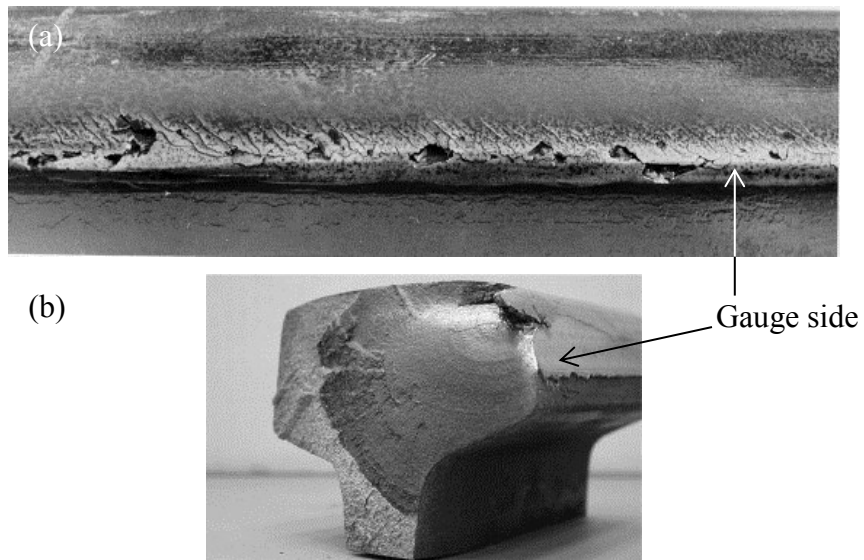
Rail defects resulting from head checks: (a) spalling originating at head checks, and (b) a rail fracture originating from a head check [3]. Copyright 2009. Reproduced with permission from Elsevier.
